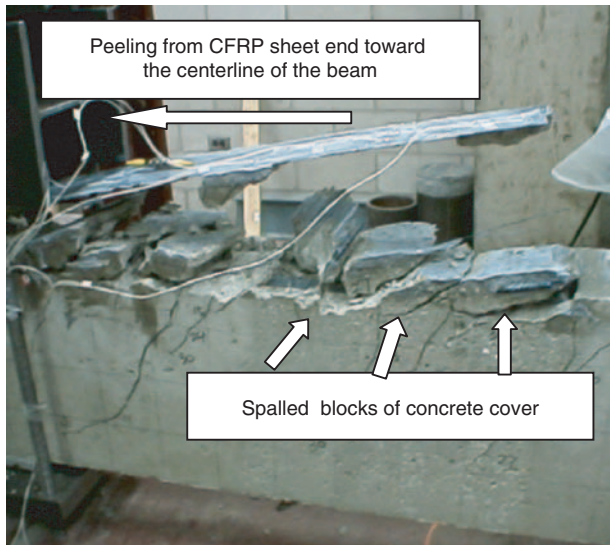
Peeling failure of concrete cover (Beam B2).
